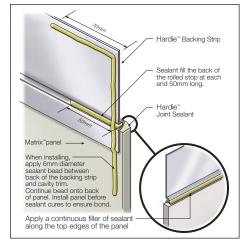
SEALING JH BACKING STRIP END DETAIL
